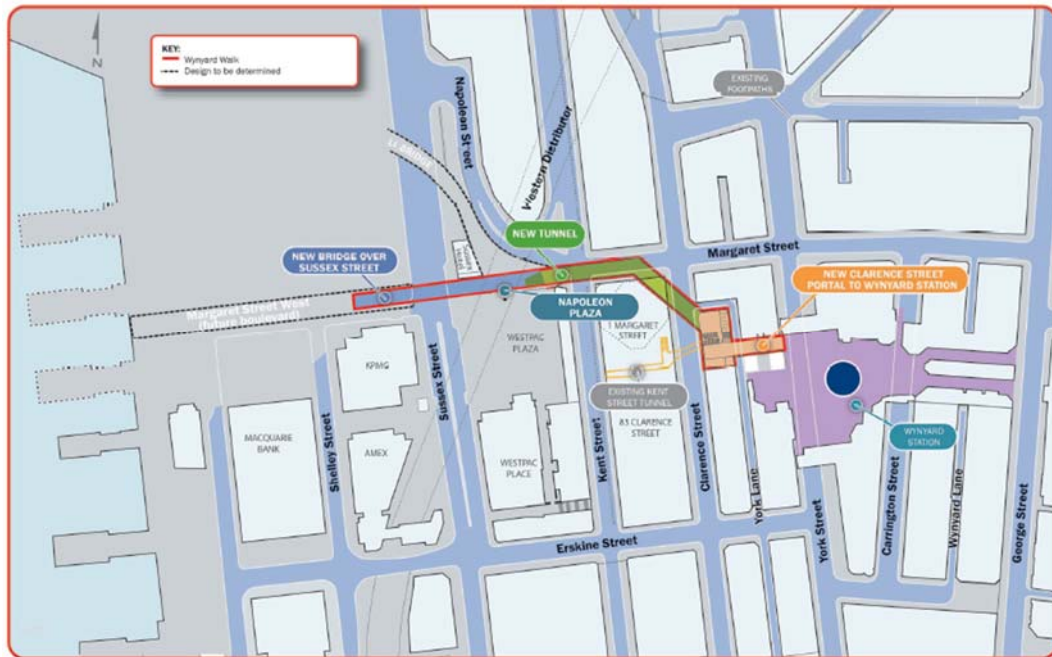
Wynyard Walk (Source: REF April 2012, Transport for NSW)
